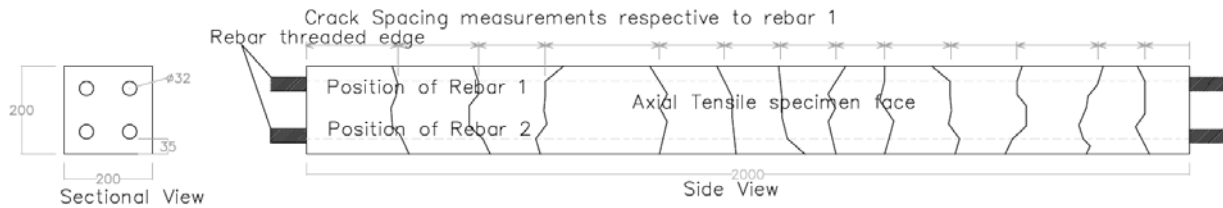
Cross section details and the side view of specimen (all the dimensions are in mm).
